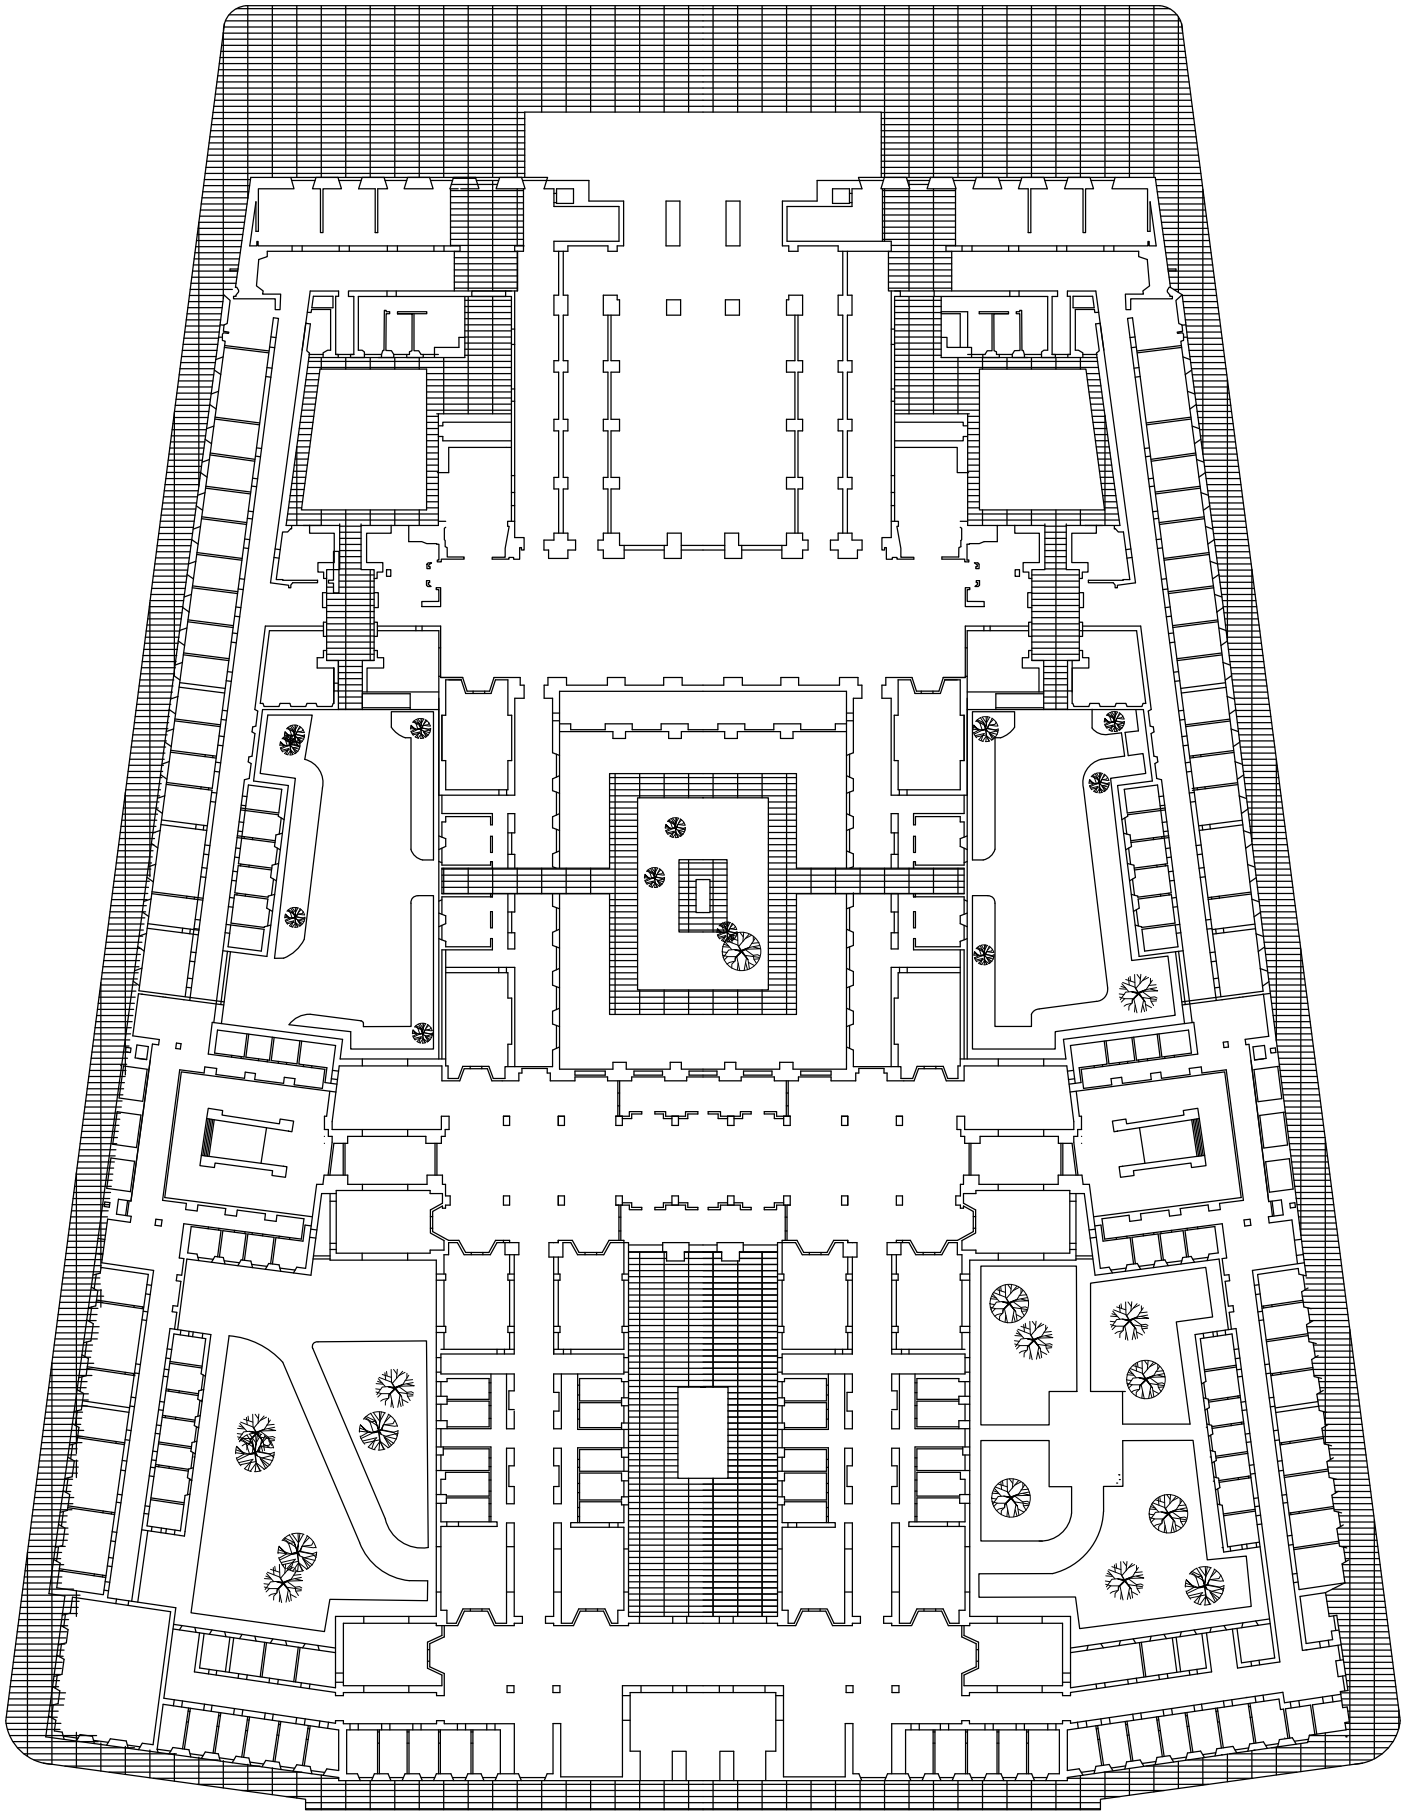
Ground Floor Plan, 50 cm above the road level.
